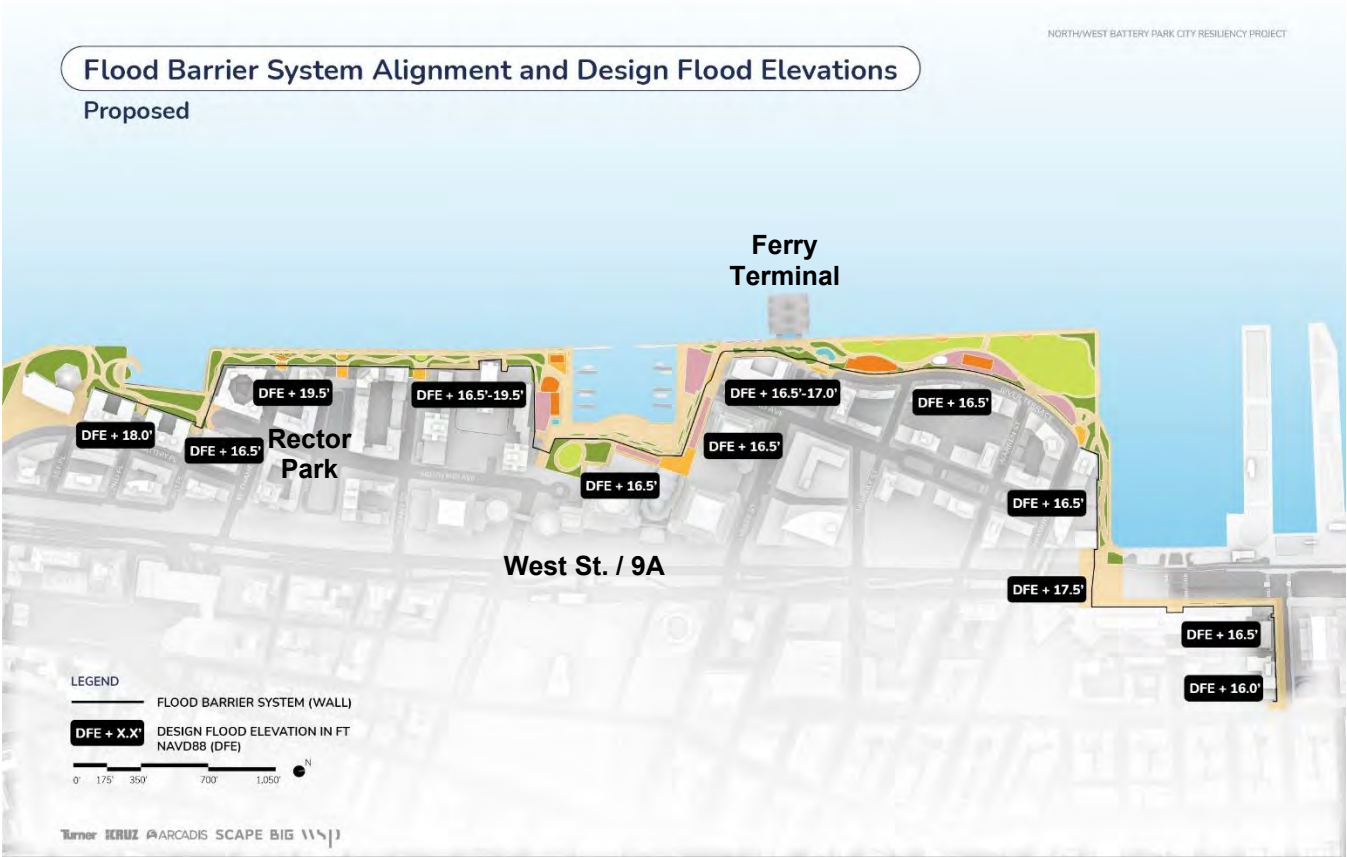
Project site and alignments and recommended top of wall elevation by reach.
